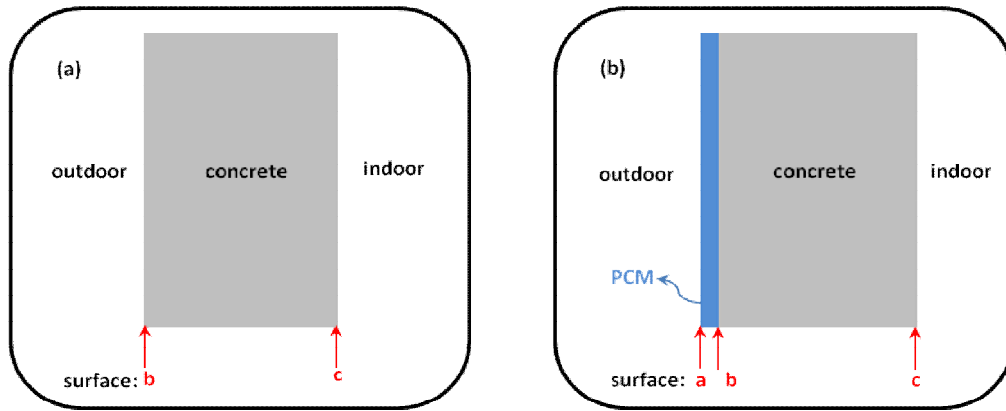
(a) Profile of the wall without PCM, (b) Profile of the wall with PCM on the outside surface
